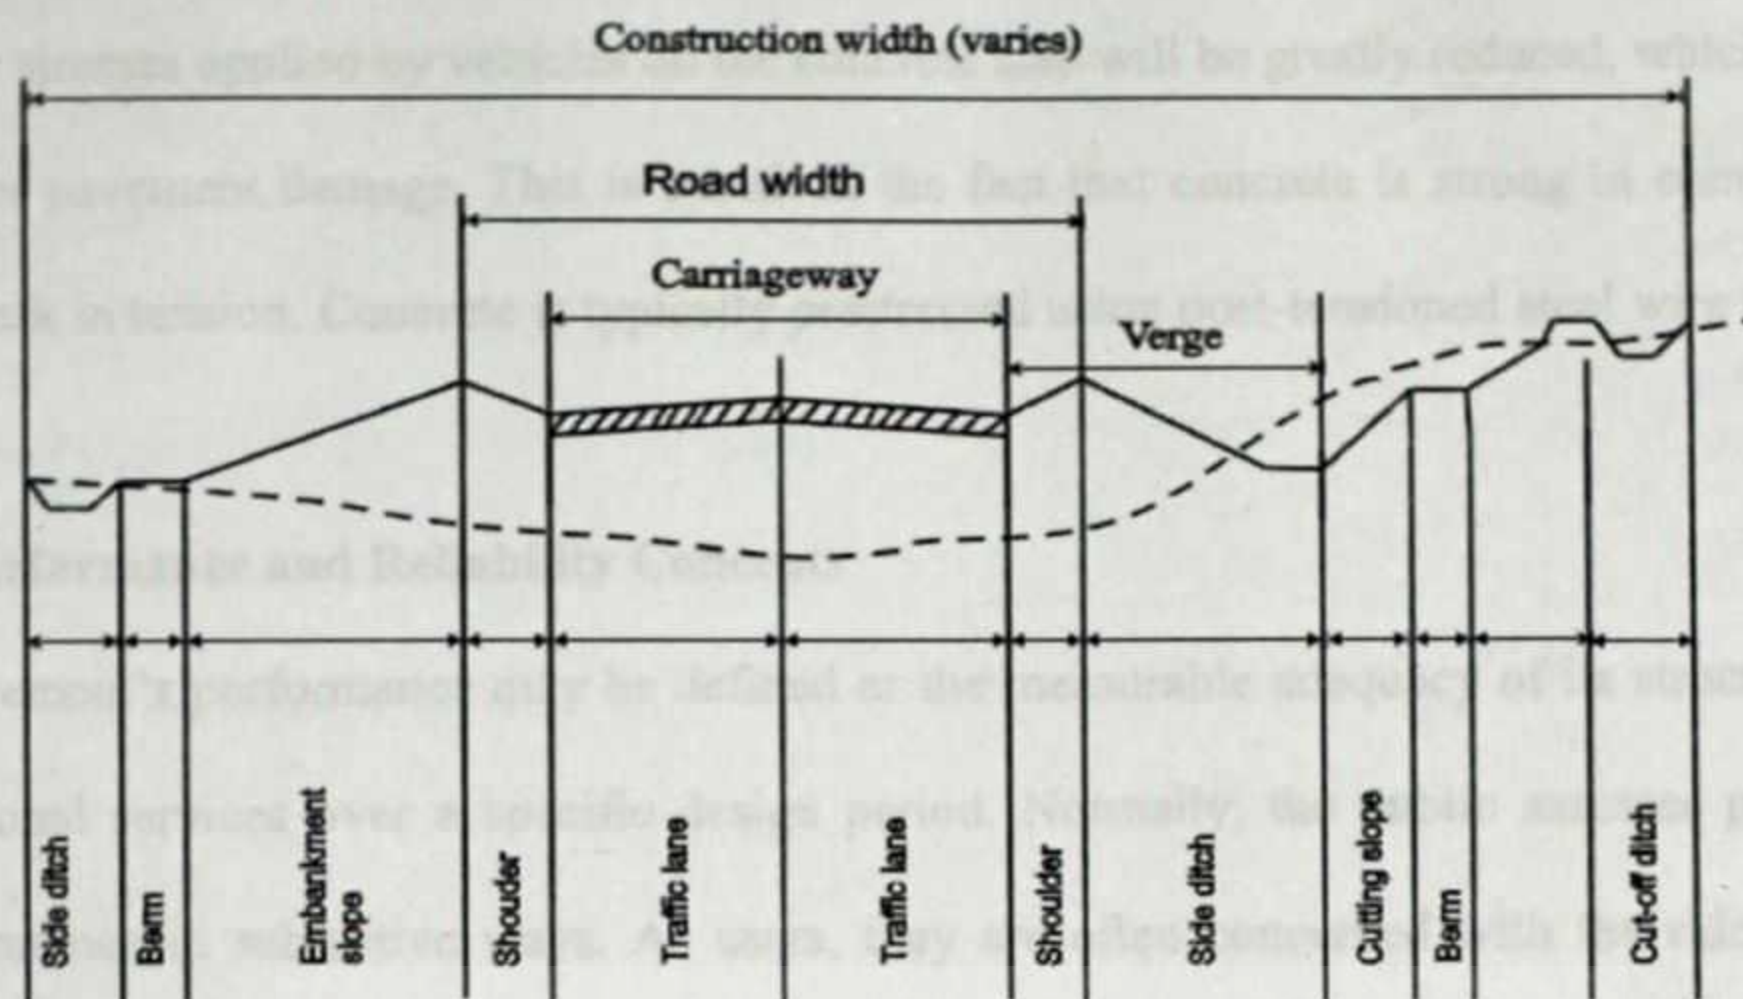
Cross-section of a typical road pavement (AASHTO, 1993).
